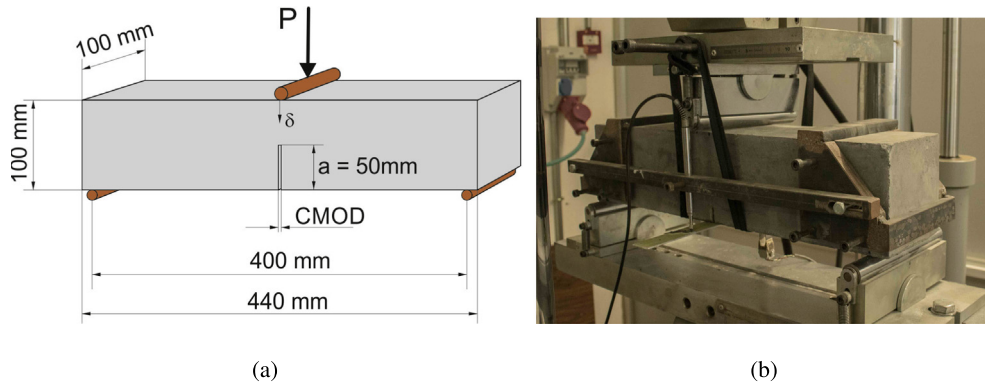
Three-point bending test: a) drawing of the test with its dimensions and b) photograph of one of the notched D0 specimens during the test.
